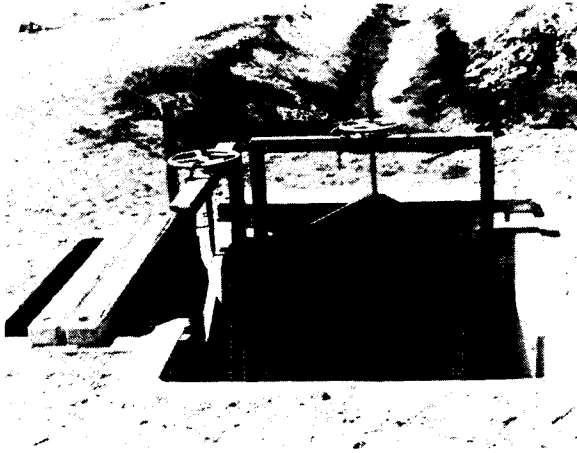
Pipe division box. Note 3-foot adjustable weirs center and left. P222-116-53582
